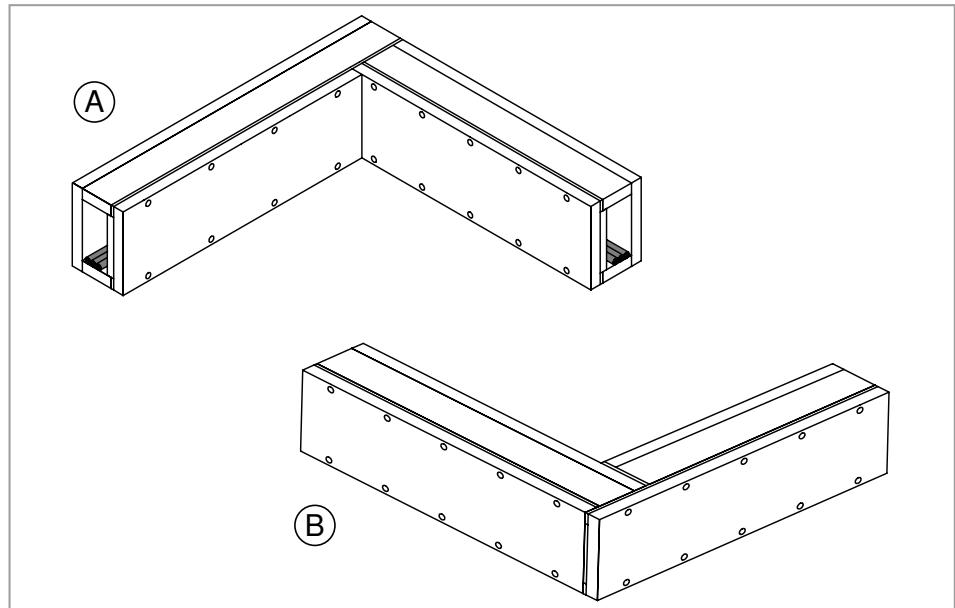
(A) 90° internal corner, (B) 90° external corner
